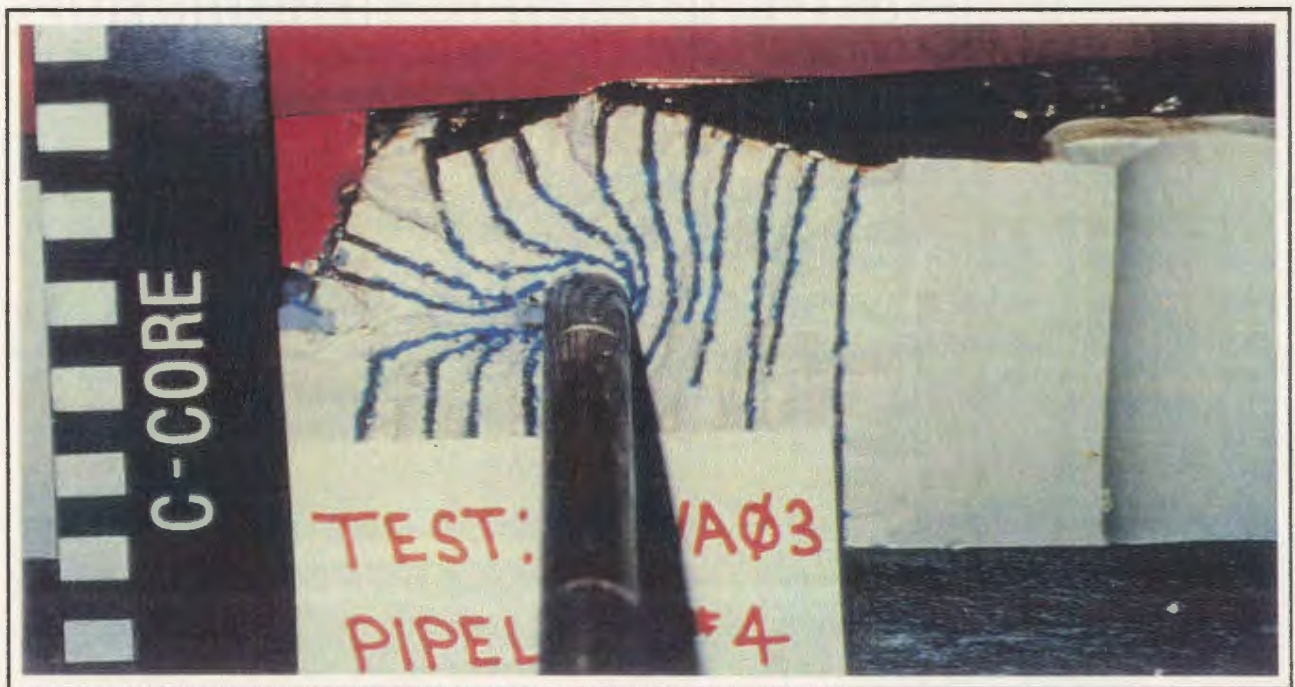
Photo of excavated cross-section along mid length of model pipeline #4, 30mm wide trench, Test 03.
